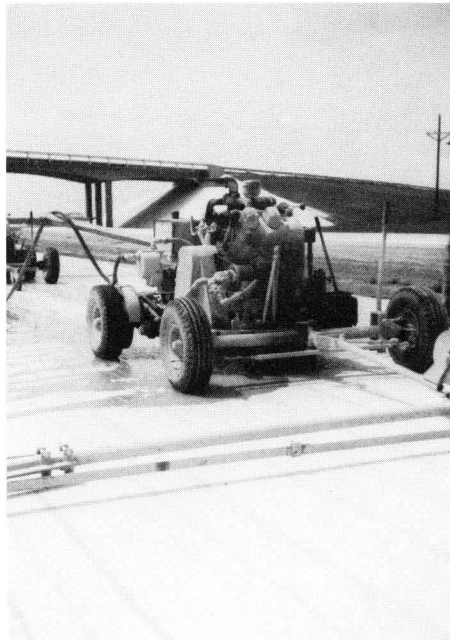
SELF-PROPELLED, MOTOR-DRIVEN DIAMOND SAW UNITS CUTTING LONGITUDINAL CENTER GROOVE IN 24-FOOT CONTINUOUSLY REINFORCED CONCRETE PAVEMENT.
